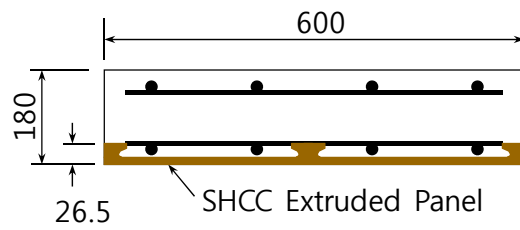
Cross-sectional details of an extruded SHCC and reinforced concrete slab
